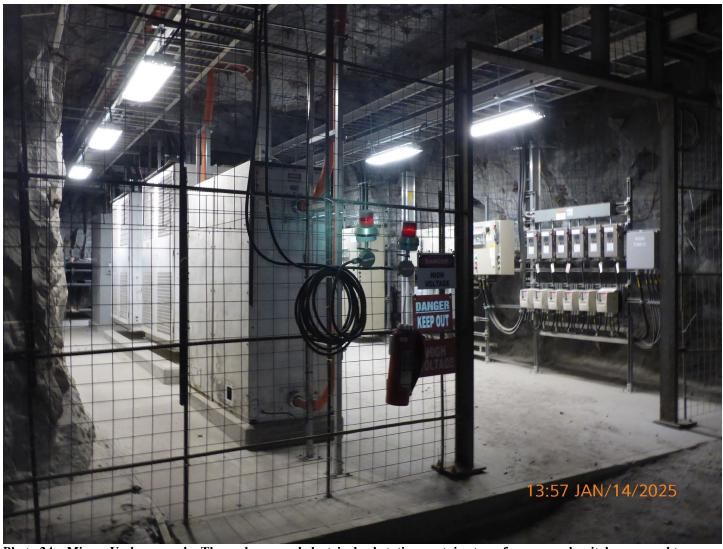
Misery Underground – The underground electrical substation contains transformers and switch gear used to operate underground fans and pumps.
